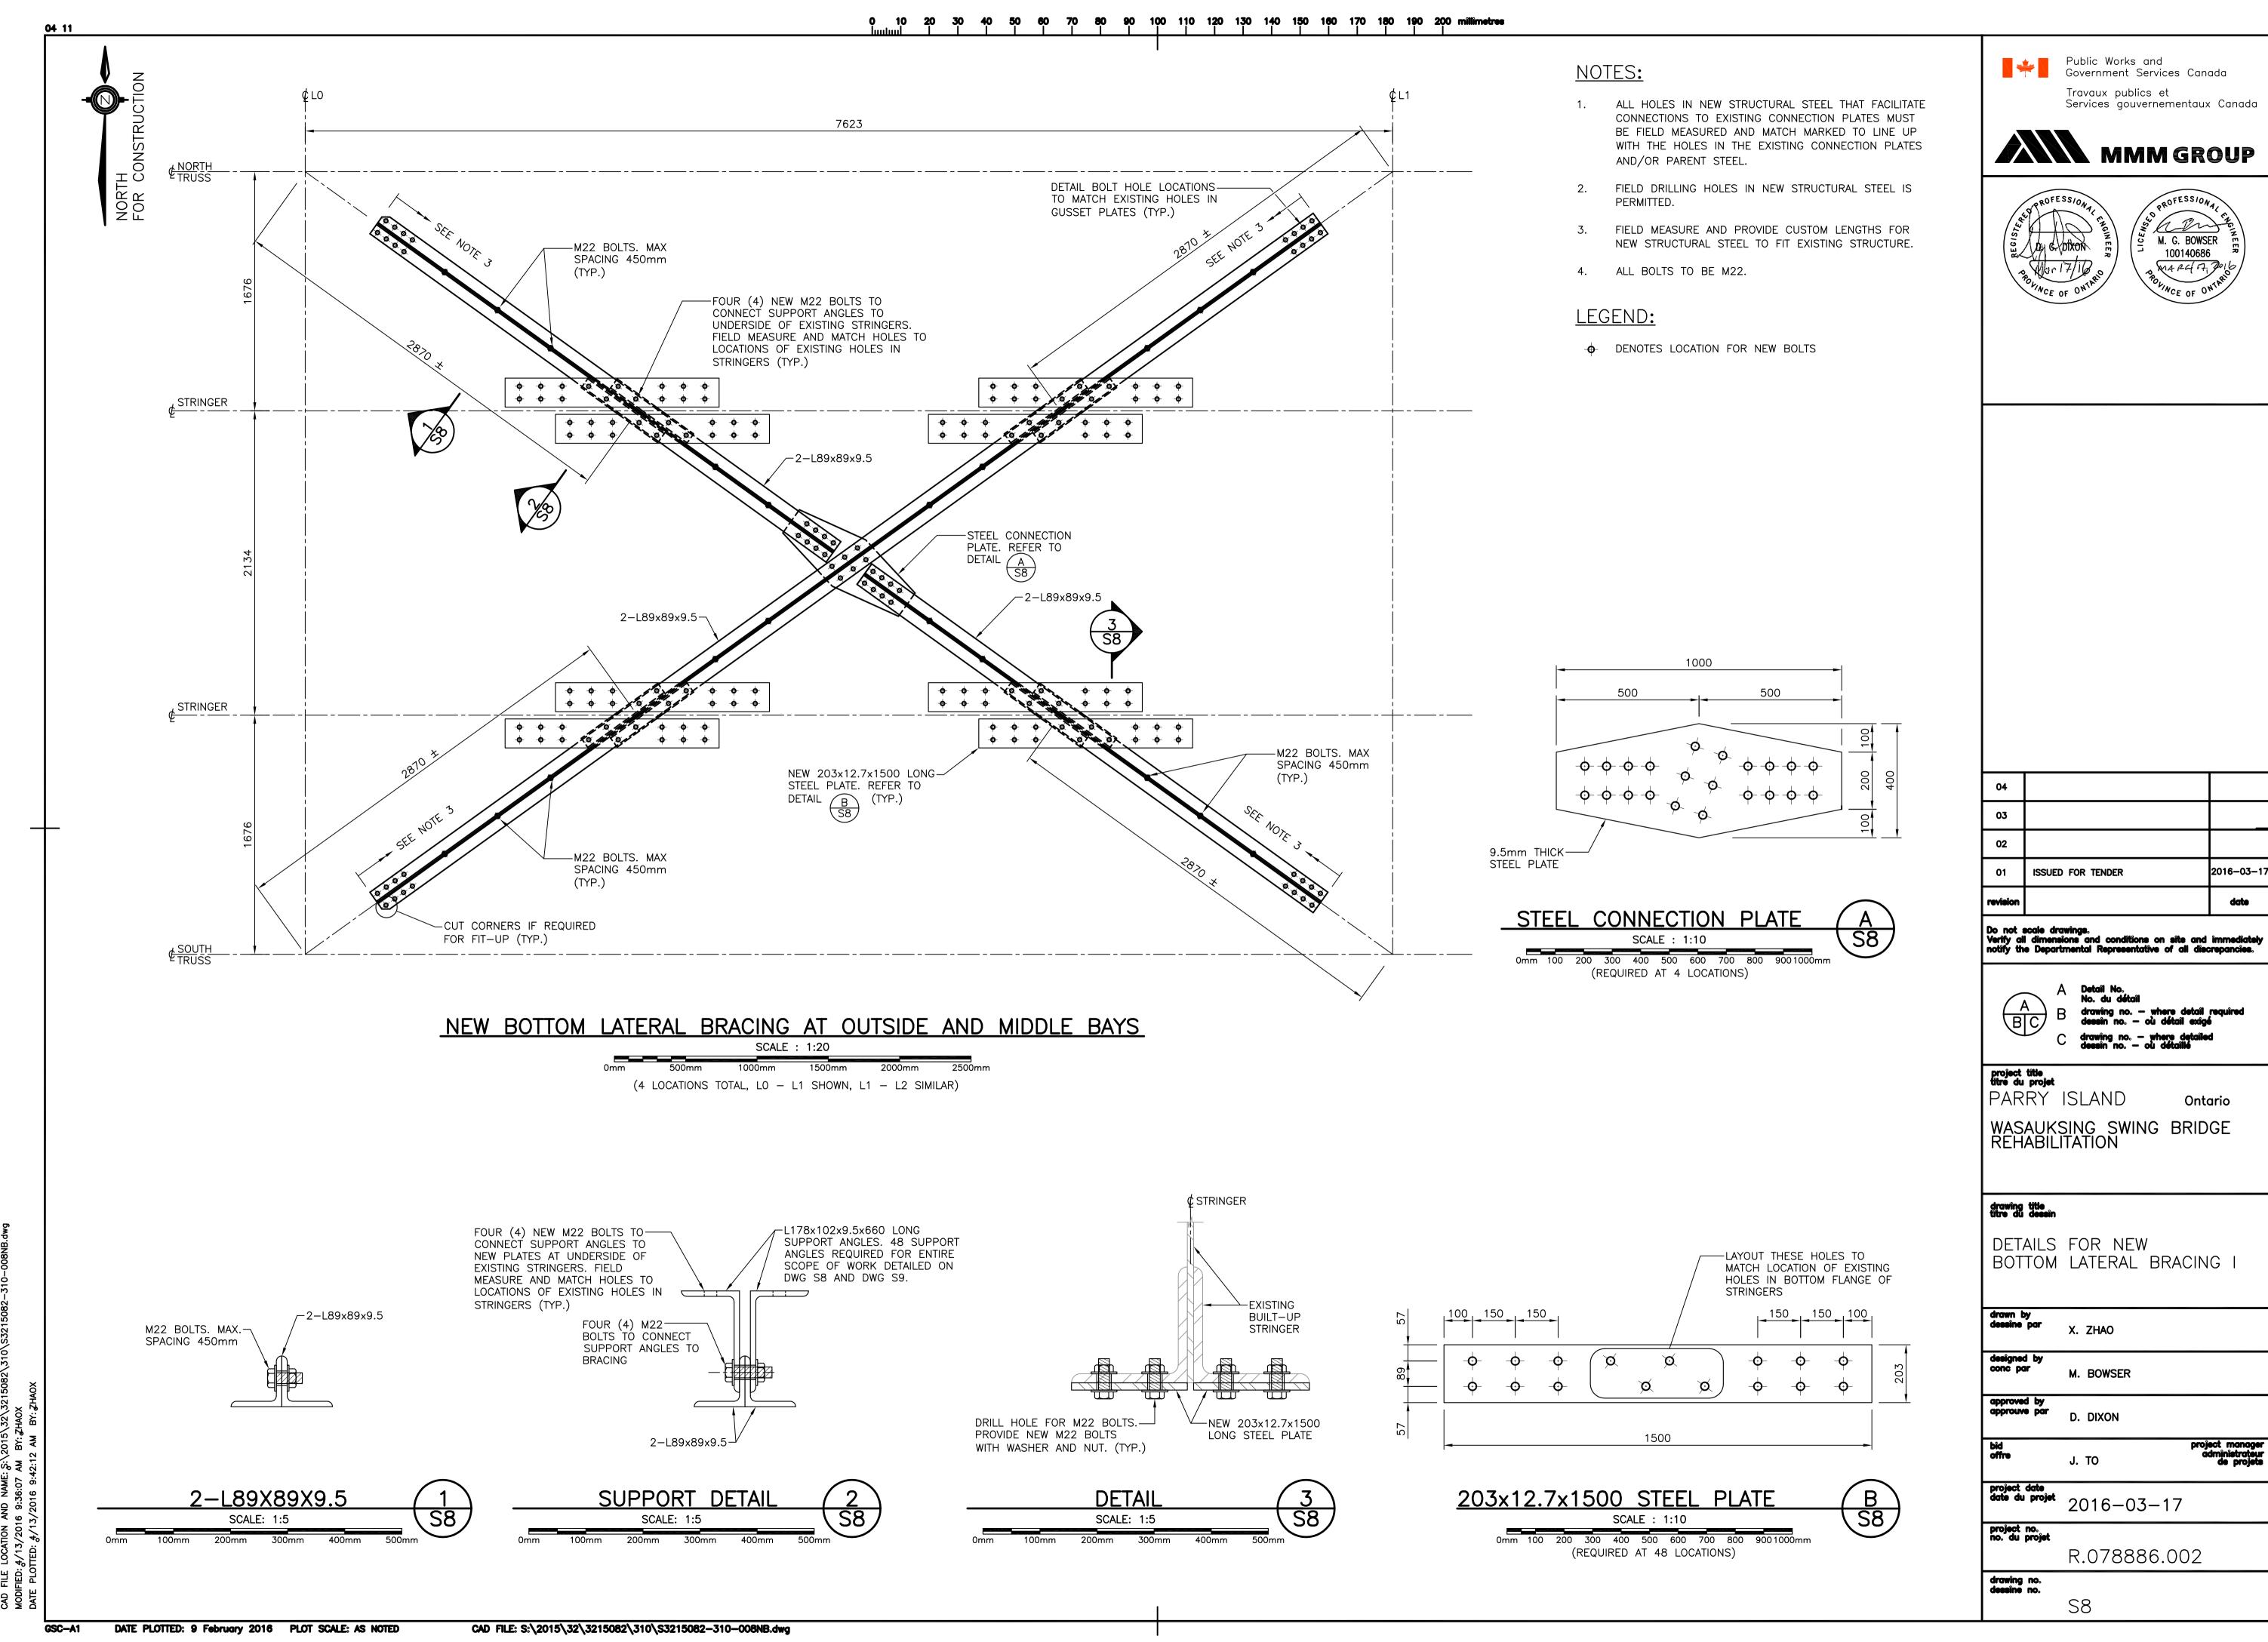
DETAIL - NEW BOTTOM LATERAL BRACING ( A
